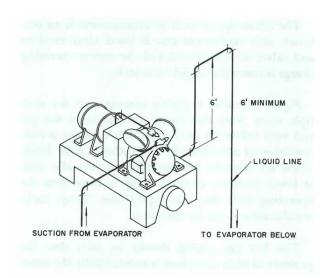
Liquid Line From Condenser or Receiver to Evaporator Located Below
